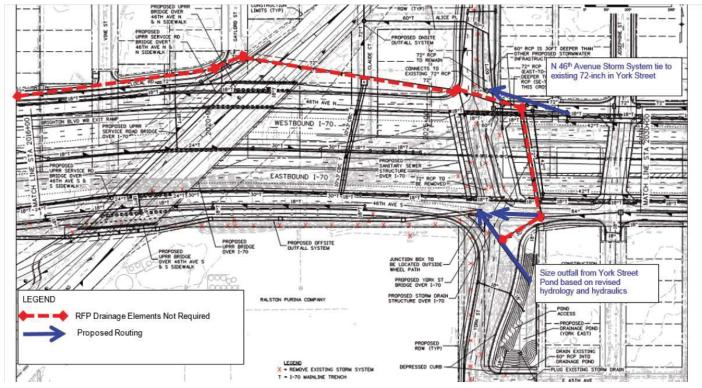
ATC 12.2 design off-site storm sewer routing connecting to GLO
